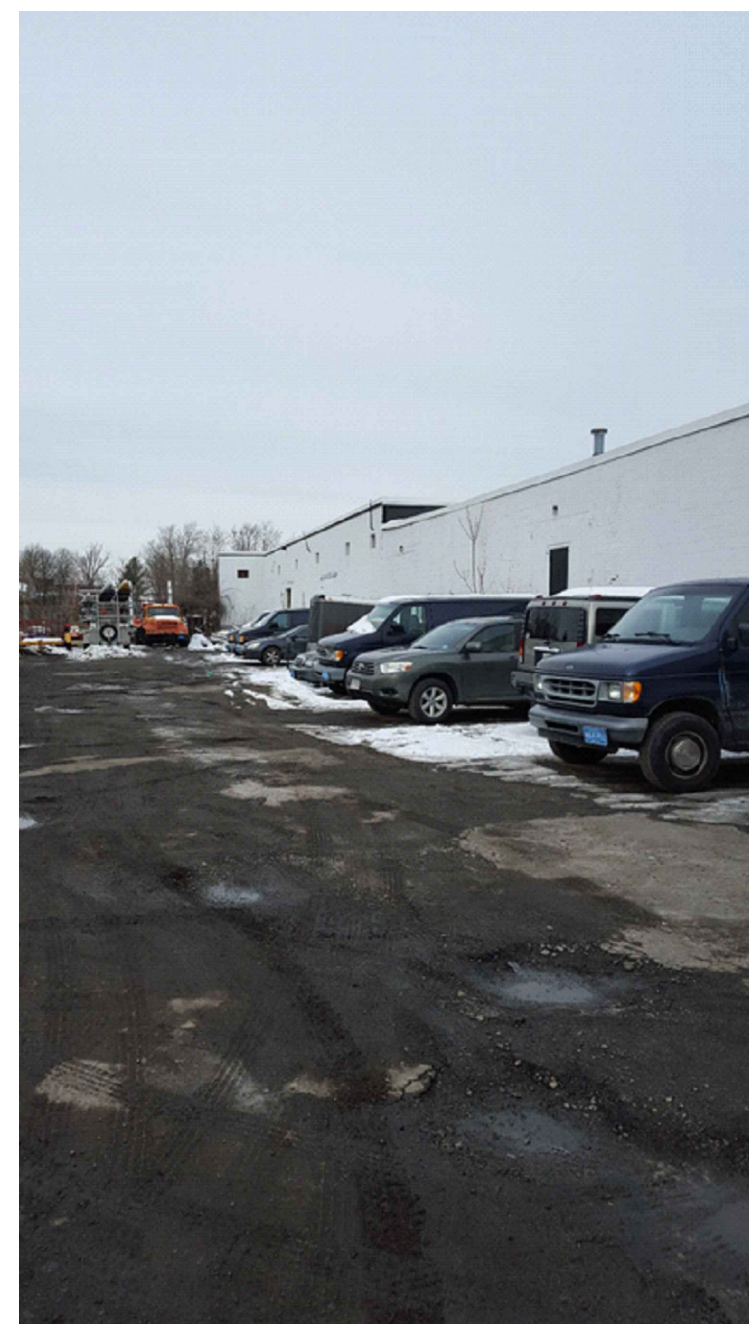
REAR OF BUILDING AND ABUTTING PROPERTY TO THE WEST
